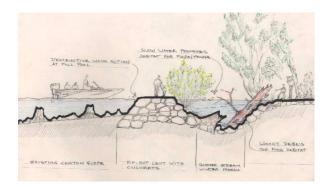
C,D; Detroit Flats Proposed Shoreline Stabilization
